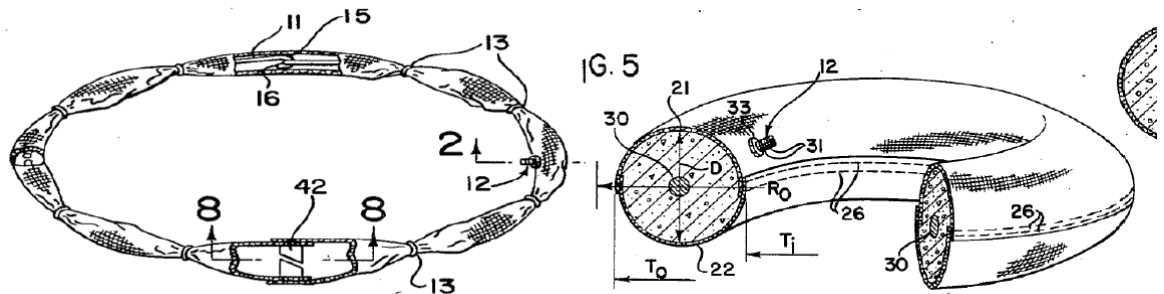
Tubular fabric form (left), cylindrical fabric-formed concrete body (right) (Lamberton, 1968)
